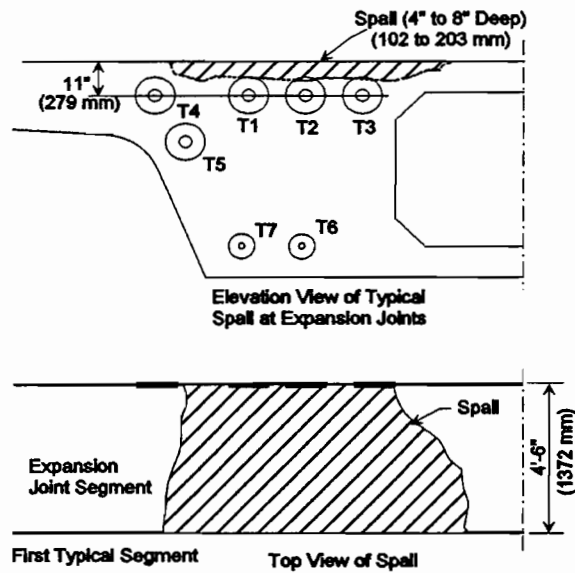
Typical spalls in expansion joint segment.
